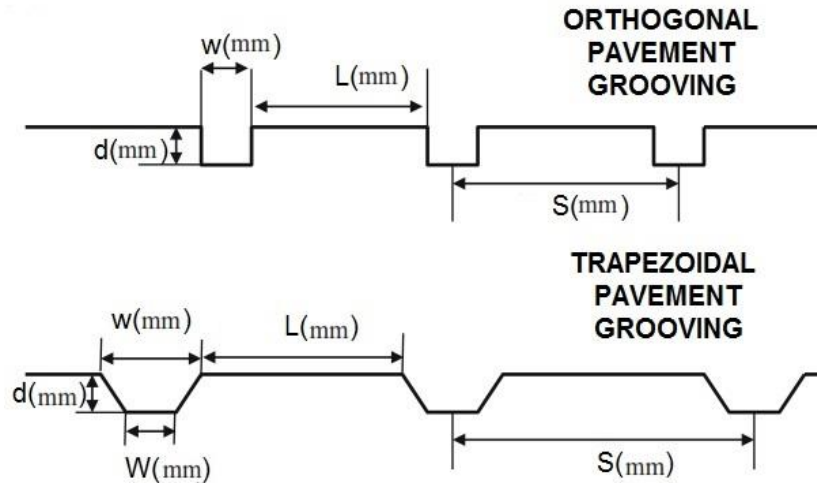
Cross-section of grooving in orthogonal and trapezoidal pattern.
